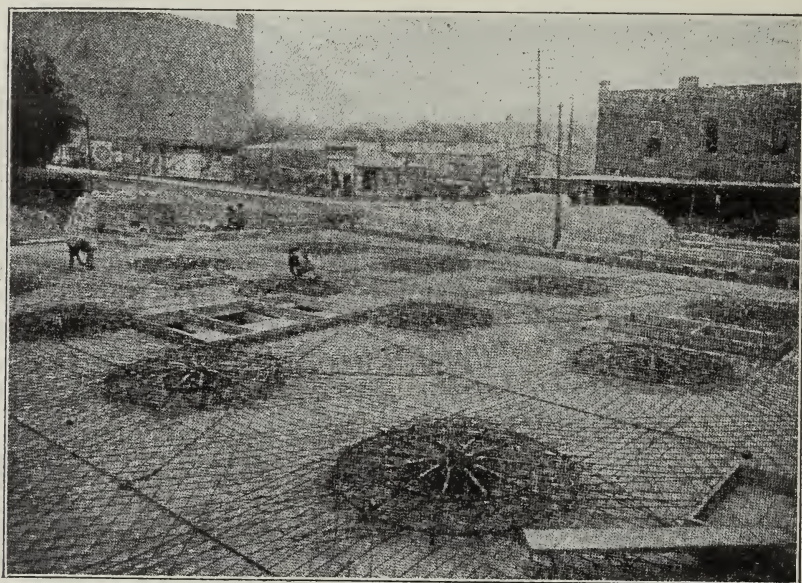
Mushroom System of Reinforced Concrete Construction.
